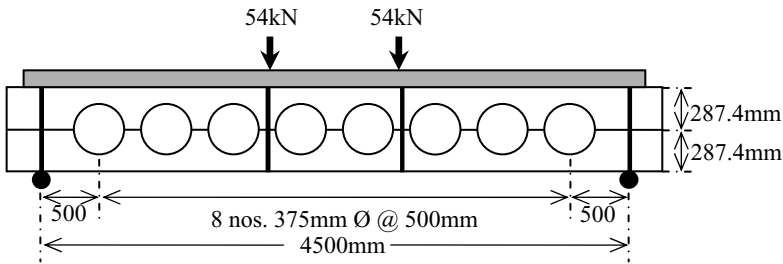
Geometric detail of symmetric composite cellular beam test (Type A)
